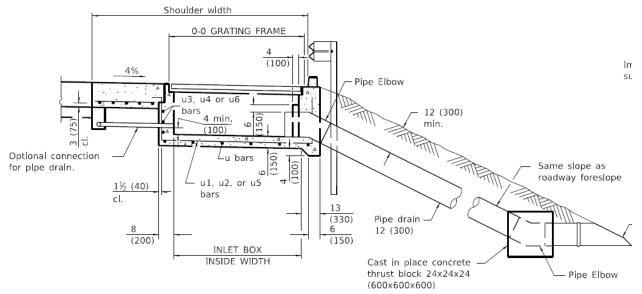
Standard Drawings for Shoulder Inlet with Curb-IL
